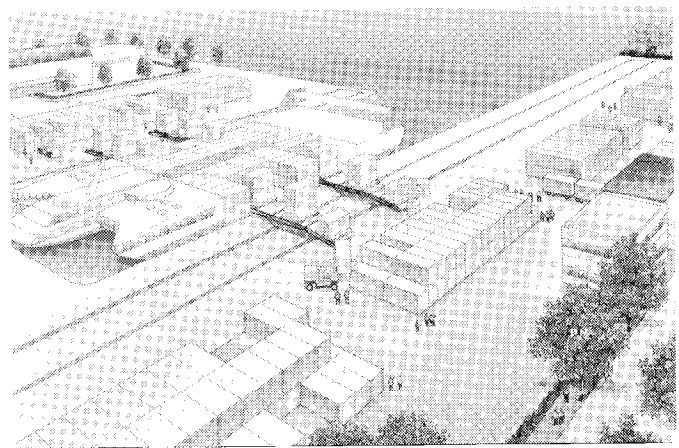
U-Shaped Pier Arrangement by Ministry of Transport
